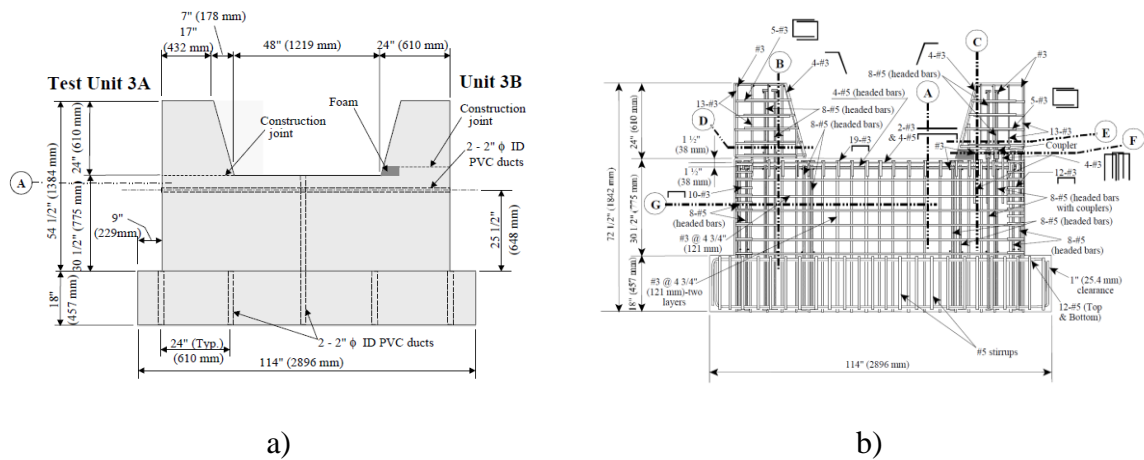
Design of Specimen 3: a) post-tensioning and construction joint location; b) elevation view of design details (from Megally et al., 2002)
